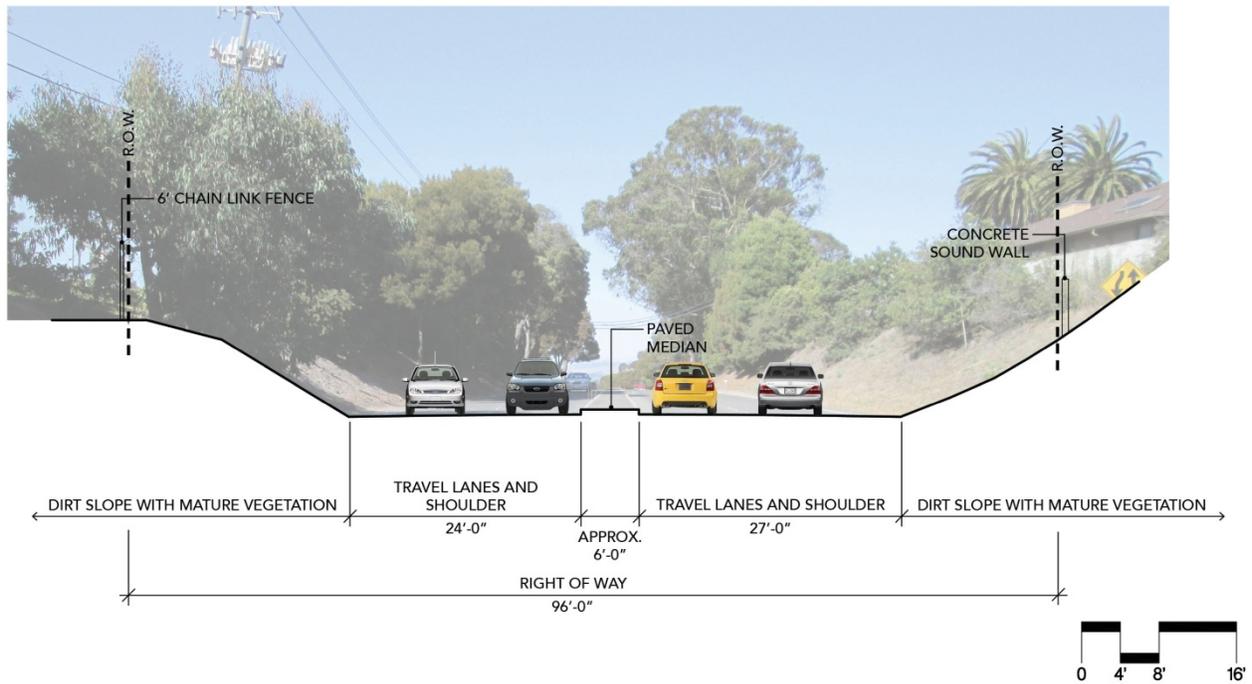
San Pablo Avenue Section 3 – Looking northbound at crest of hill
